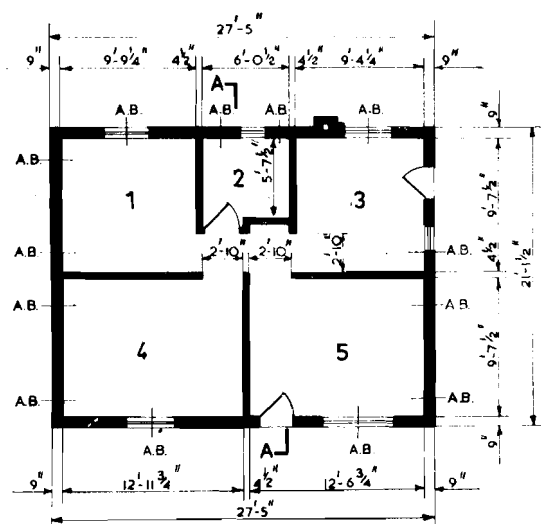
South African National Housing and Planning Commission (1951). One-storey “four-square” house, Type NE. 51/9. Floor area 47.4 m². 1 bedroom (earth floor), 2 bath (concrete floor), 3 dining kitchen (concrete floor), 4 bedroom (earth floor), 5 living and sleeping quarters (earth floor).
